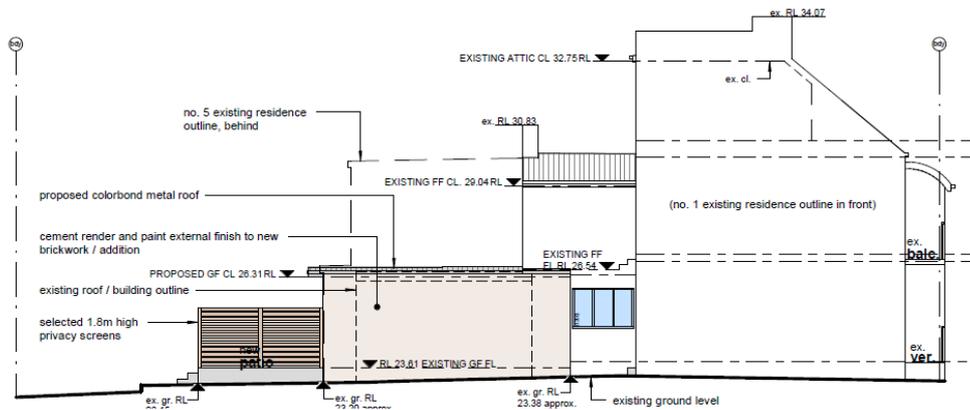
Proposed south-eastern elevation – 3 Oswald Street Randwick (Source: John Spiteri Design and Drafting)
